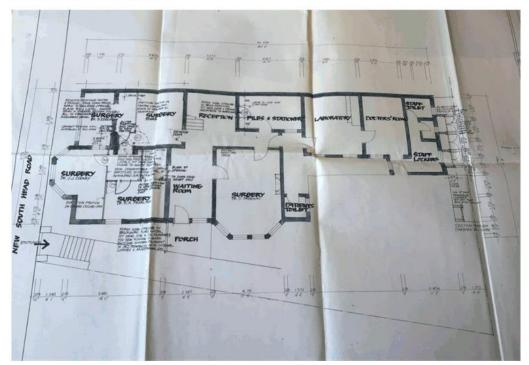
Plans dated 1975 for alterations and additions to 148 New South Head Road.
